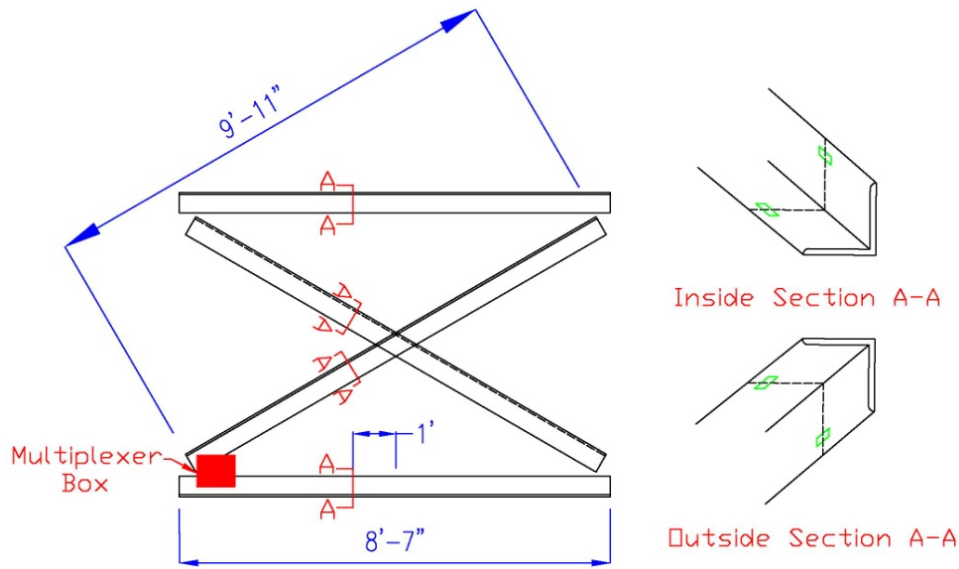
X1 & X2 Elevation View w/ Gage Locations
